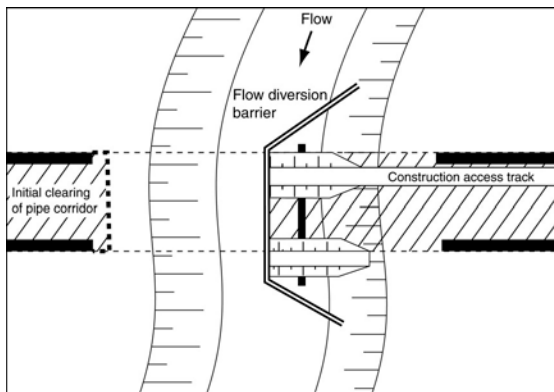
Partial channel clearing and partial installation of cofferdam and construction access
